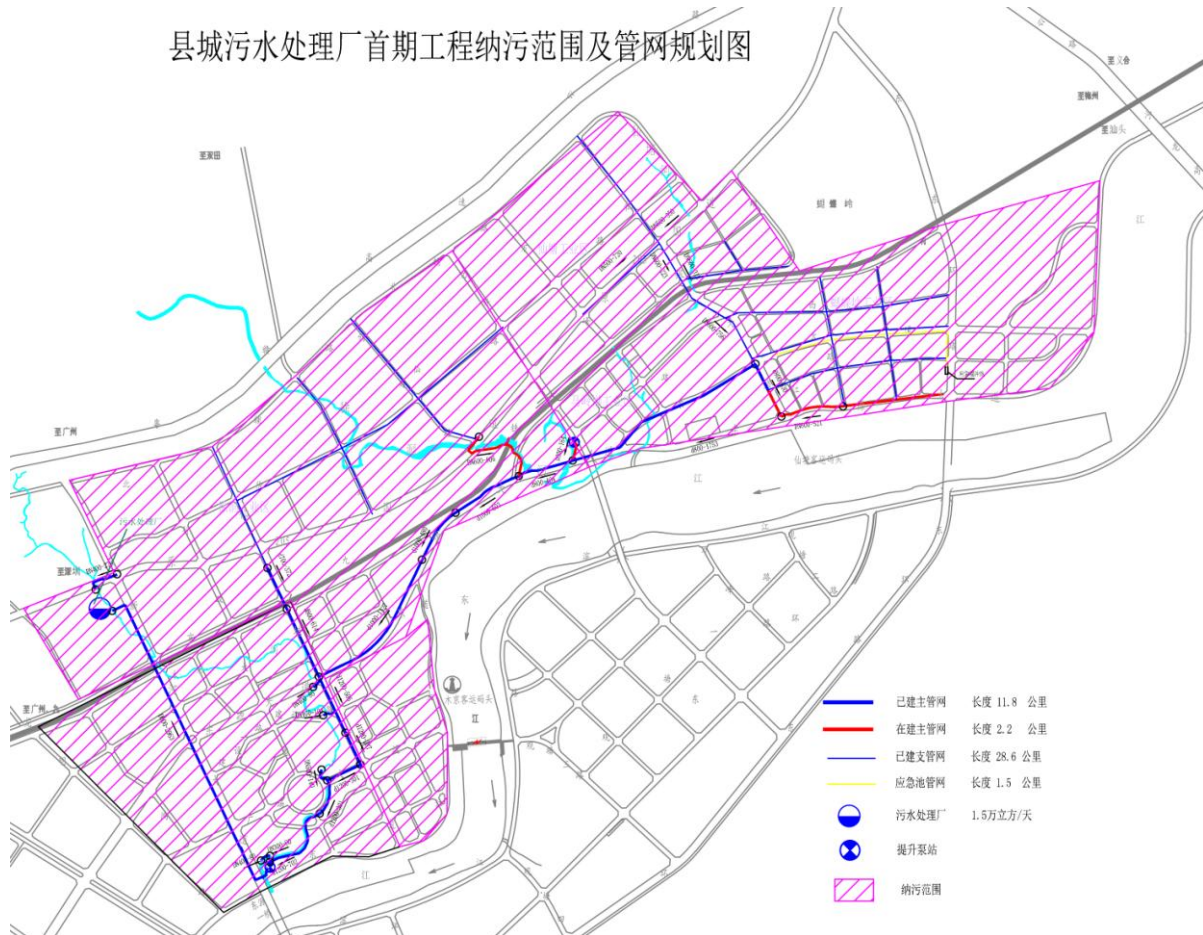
sewage treatment plant collecting scope and pipe network construction of Dongyuan County (First period)
